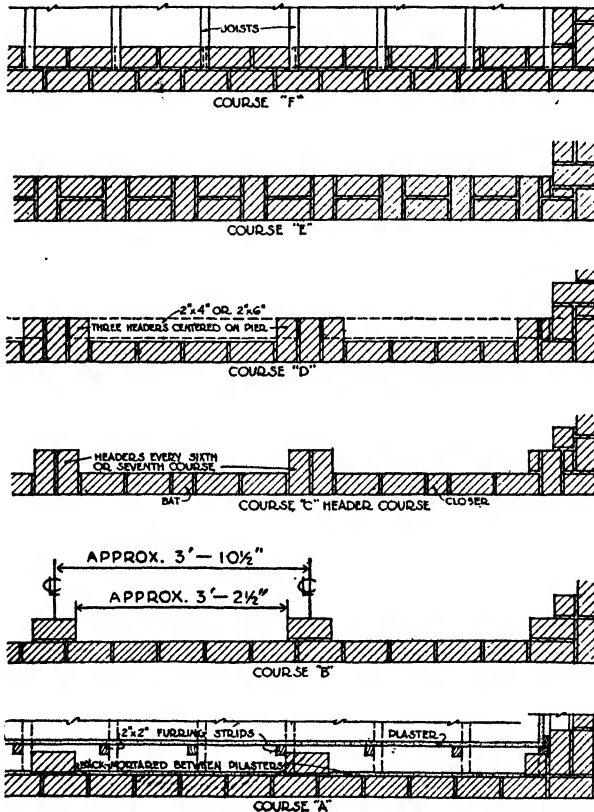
Plan showing construction of Economy wall by courses. Pilasters should be spaced to give 8-in. solid construction around all windows and doors.
